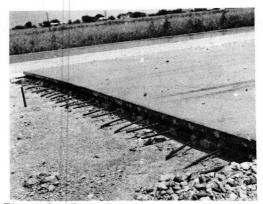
Typical transverse construction joint for Falls-McLennan County Project.
